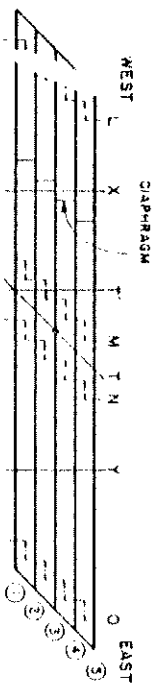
LOCATIONS OF SKEW SECTIONS INSTRUMENTED WITH STRAIN GAGE ROSETTES ON GIRDER WEBS
